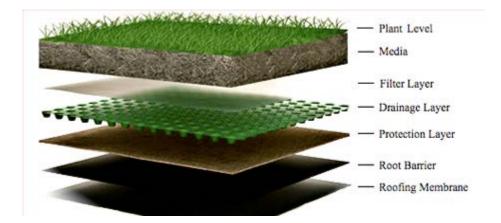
Green roof layers (photo: www.godfreyroofing.com)
